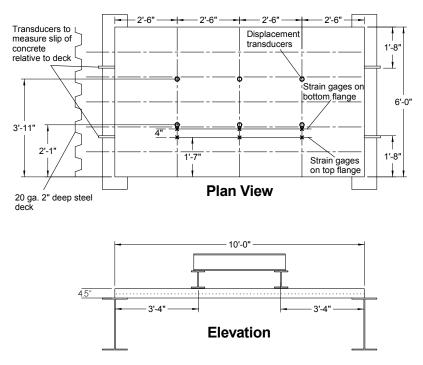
Test specimen and instrumentation for flexural strength tests
